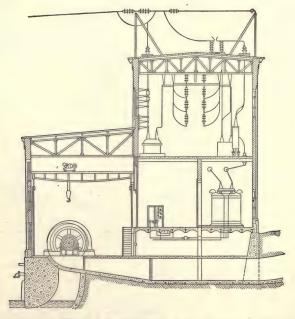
Sectional View of Power-house Arrangement. Montana Power Company, Rainbow Falls Development. (For floor plan see Fig. 99a.)
